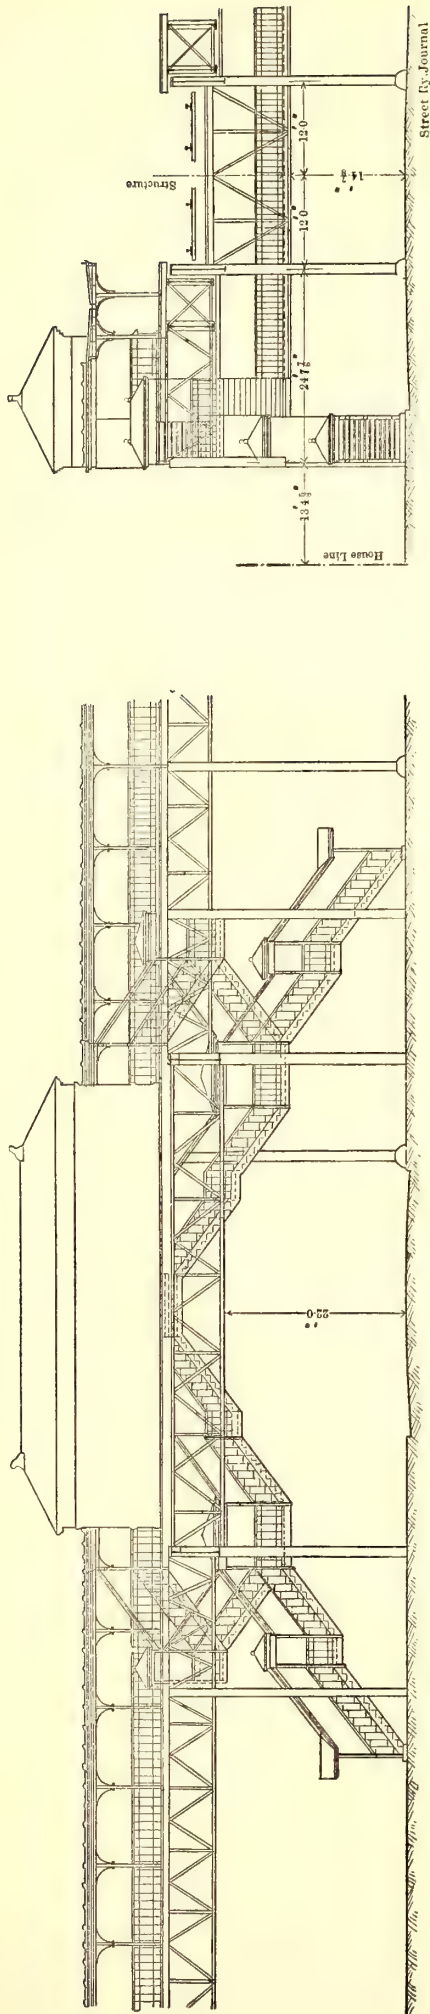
DETAILS OF ELEVATED STRUCTURE ON WEST MARKET STREET ELEVATED RAILWAY
